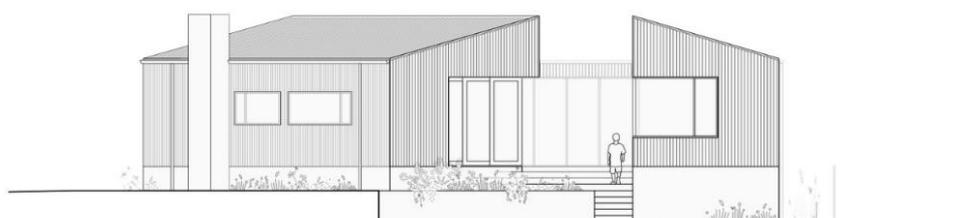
Elevation drawing of Three Piece House by TRIAS Studio¹³⁶
